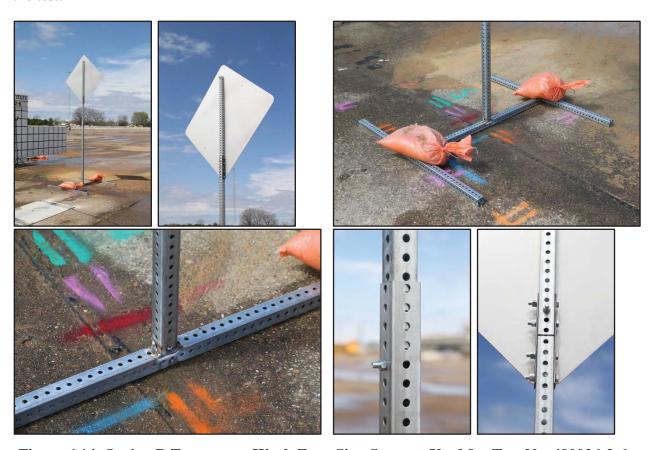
Option B Temporary Work Zone Sign Support Used for Test No. 490026-2-6.
